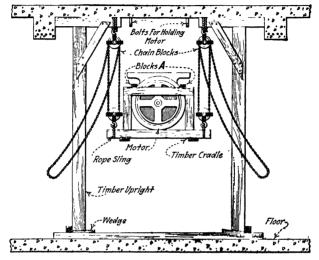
Raising motor to a ceiling in a concrete building by means of a framework supporting the chain blocks.
